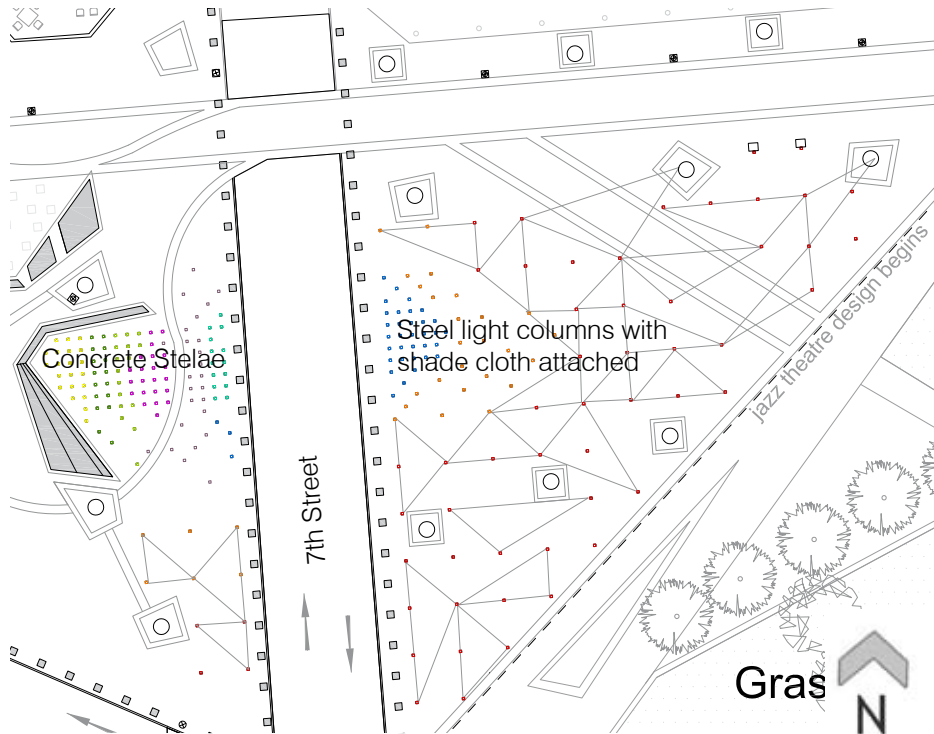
Plan of Concrete Stelae and Steel Light Columns (NTS, Author, 2009)
